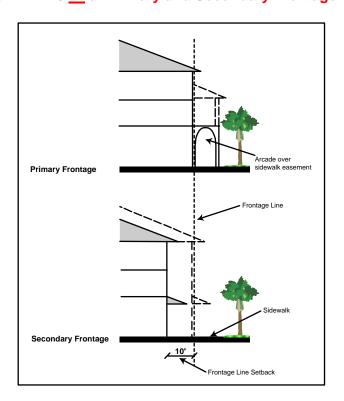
F.4.D-22 23 – TMD Building Form U/S Tier – Three Story Maximum
